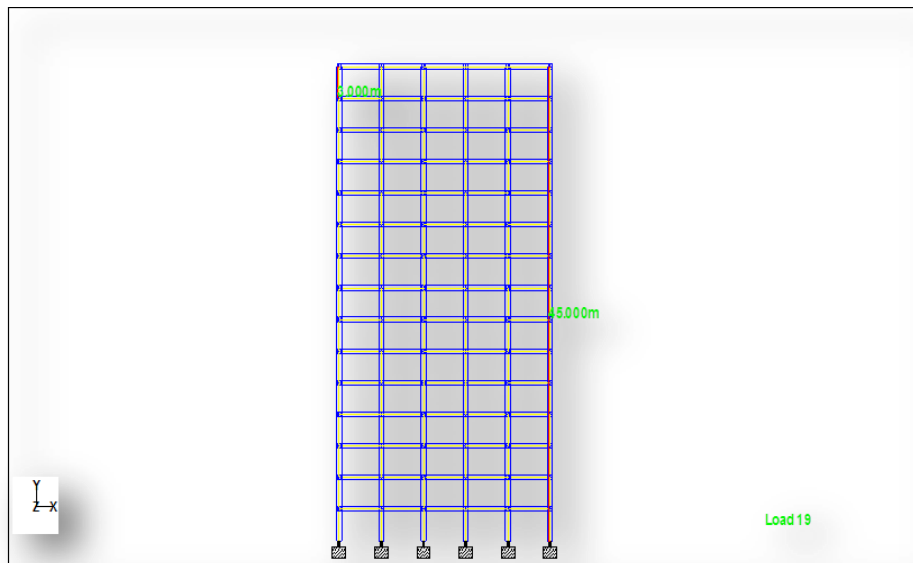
Elevation of G+15 Multi-Storeyed Building
